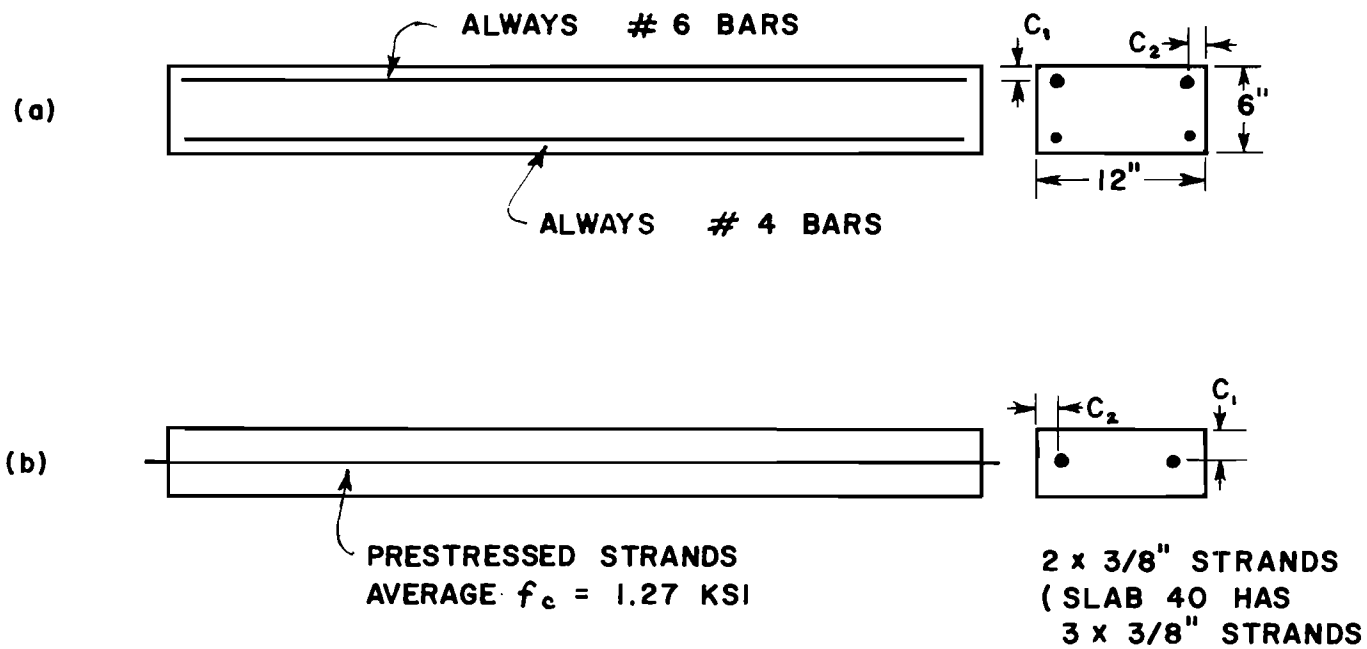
(a) Details of unloaded slabs (#27 - #36)
